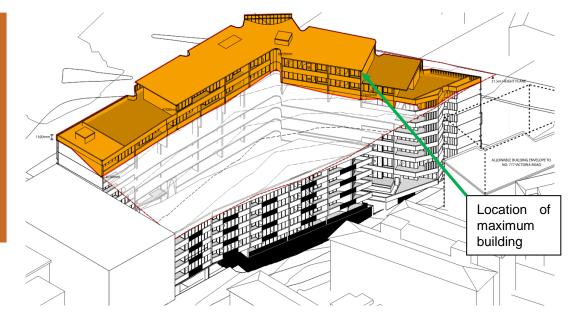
Extract of the 3D height plane perspective north, showing the location of the proposed maximum building height (Source: SJB).
